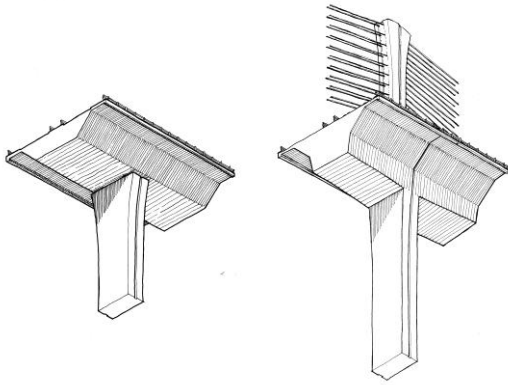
Isometric design sketch of the main extrados bridge elements: the approach span deck and pier; and the intermediate tower, haunched deck and pier. Yee Associates.
